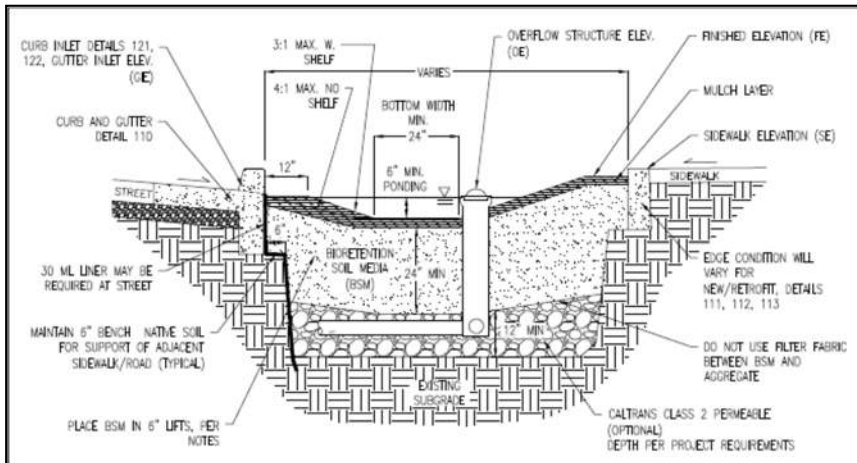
Street Bioretention Facility (sloped sided, with underdrain)
